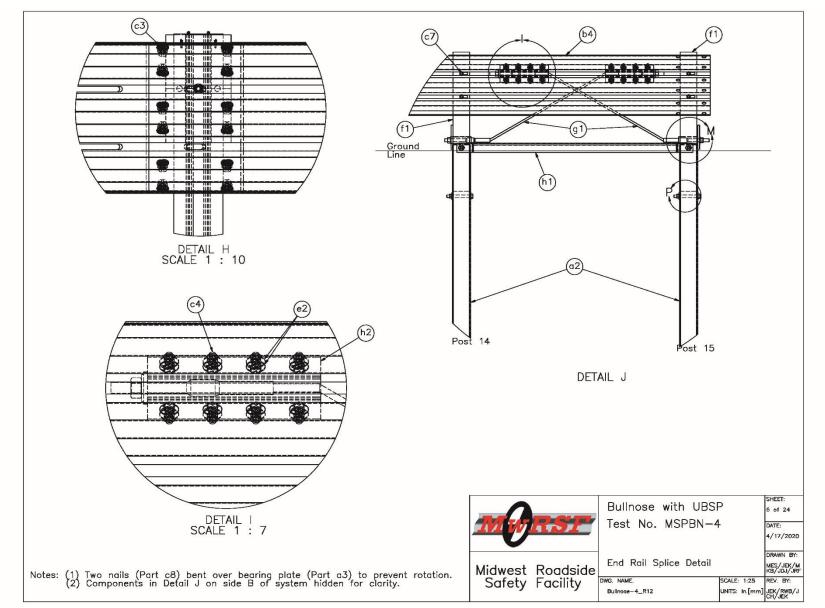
End Rail Splice Detail, Test No. MSPBN-4
